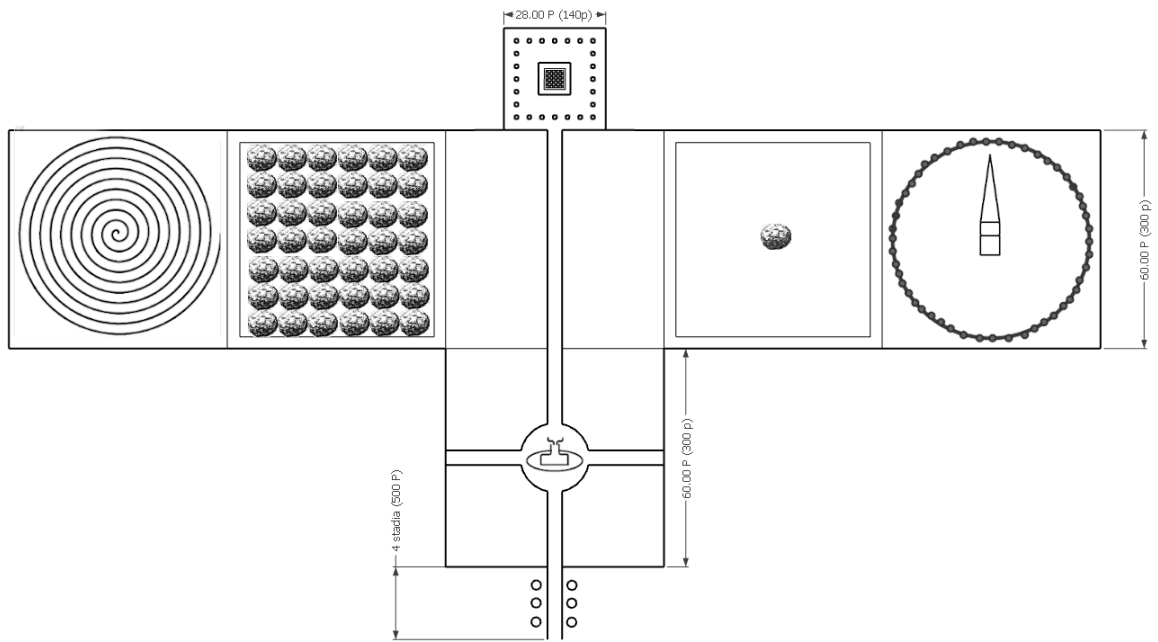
Plan of the palace and grounds of Eleuterylida
